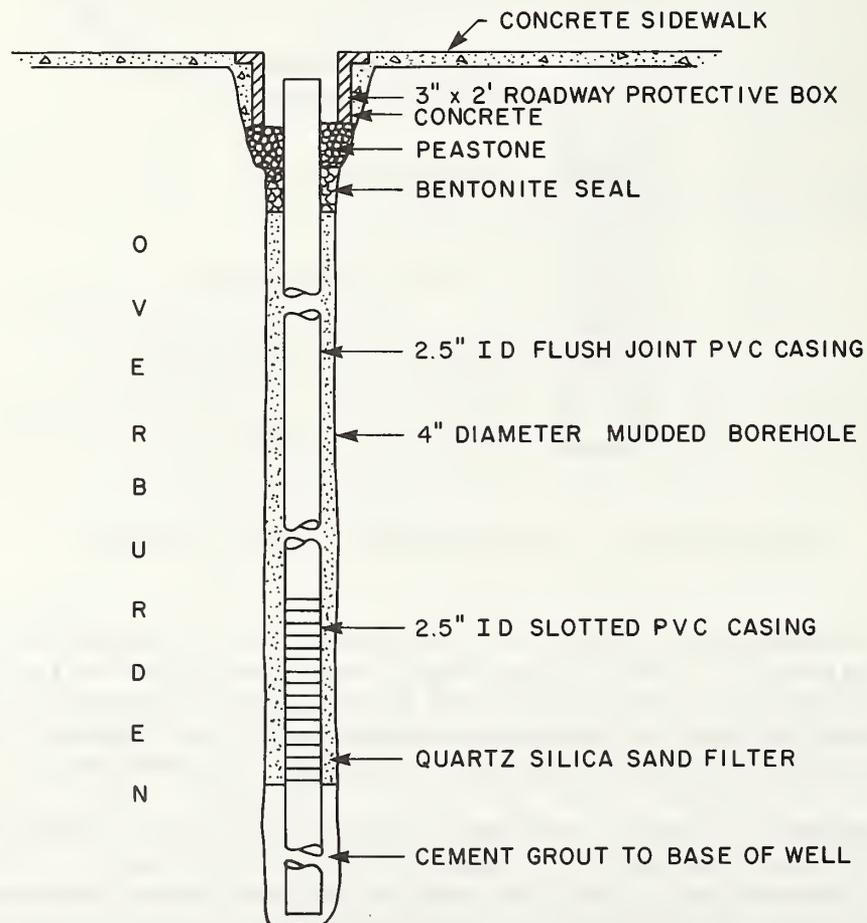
OBSERVATION WELL INSTALLATION
